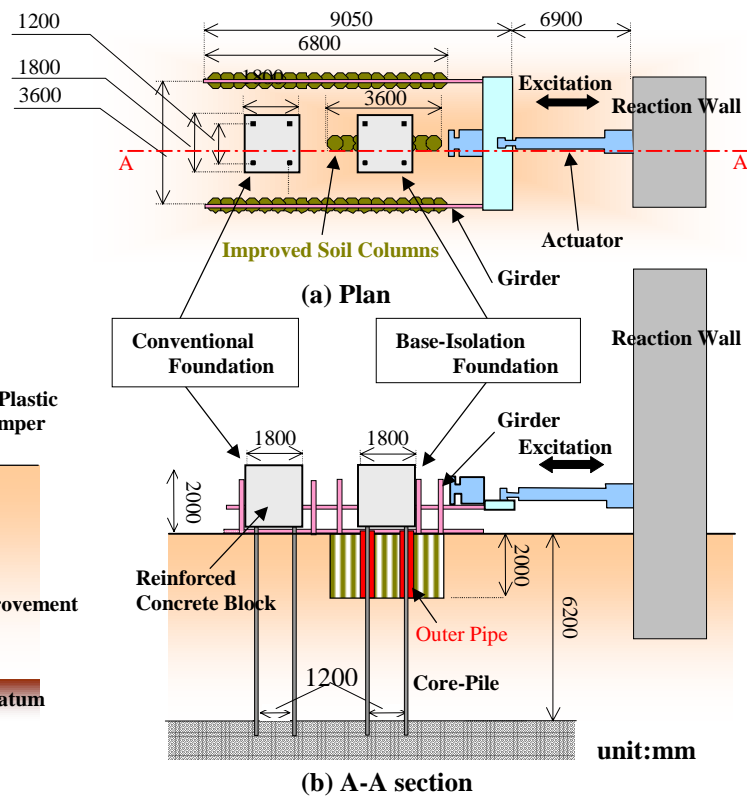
Test models (reinforced concrete block supported by pile foundation)
